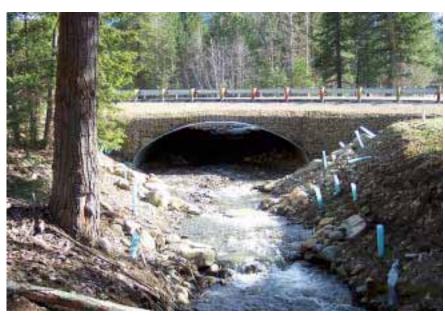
In 2005, the steel culvert was replaced with an 8 m wide structural plate steel arch stream simulation culvert allowing unrestricted fish access to over 5,000 meters of upstream habitat. In addition to restoring fish passage for chinook salmon, steelhead, bull trout and resident trout, the Dedicated Funding (I-4), \$545,000 project alleviated maintenance issues associated with clearing debris caught inside the baffled culvert and increased the culvert's capacity to accommodate 100 year flood flows.
